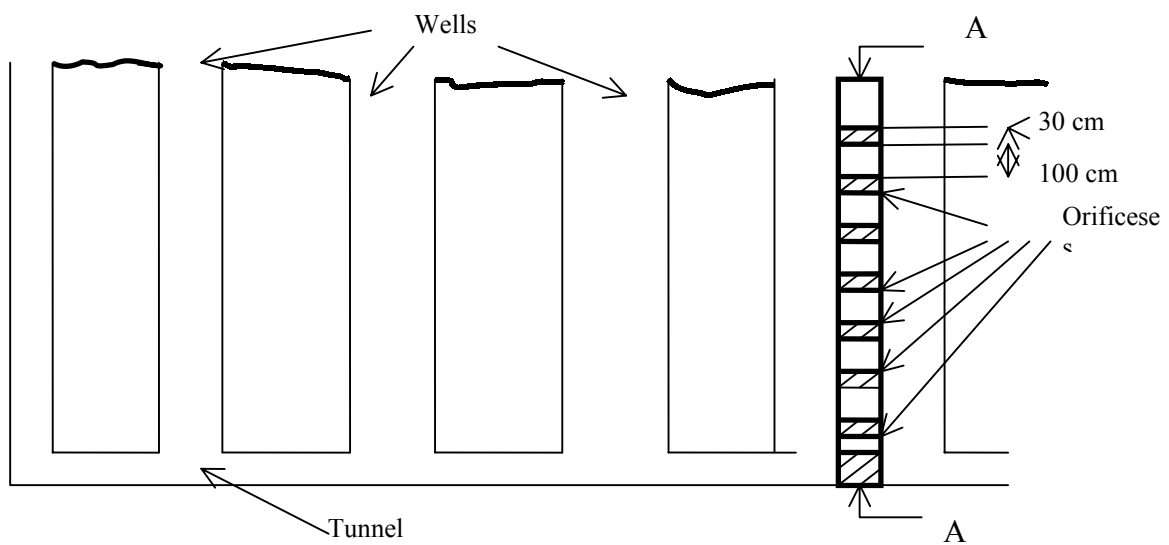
Structure of under ground dam built in Vazvan Qanat, Isfahan
